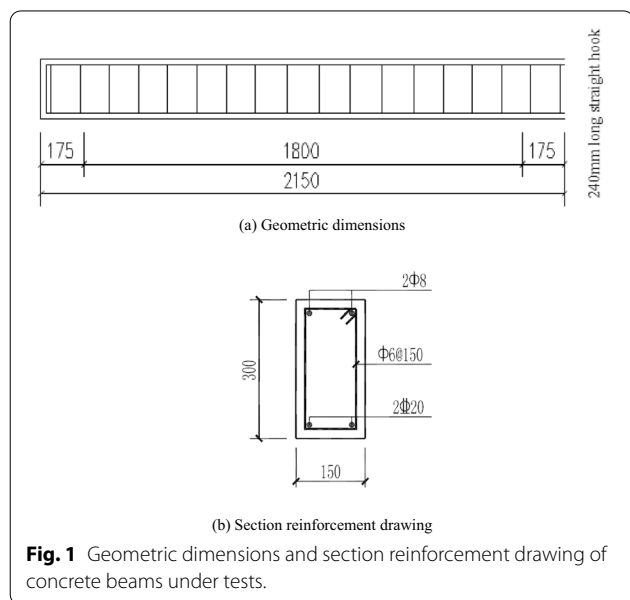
Geometric dimensions and section reinforcement drawing of concrete beams under tests.
